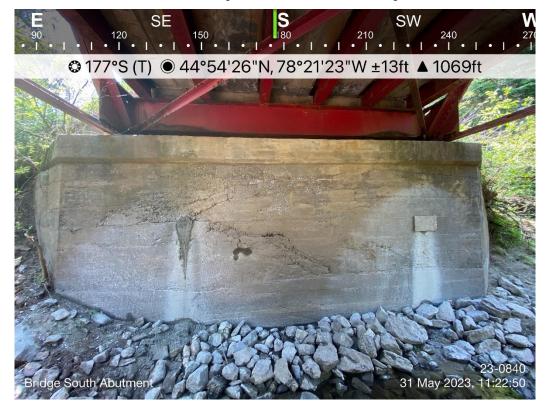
SA01 and SA02 upon filling. Photo taken face south.
